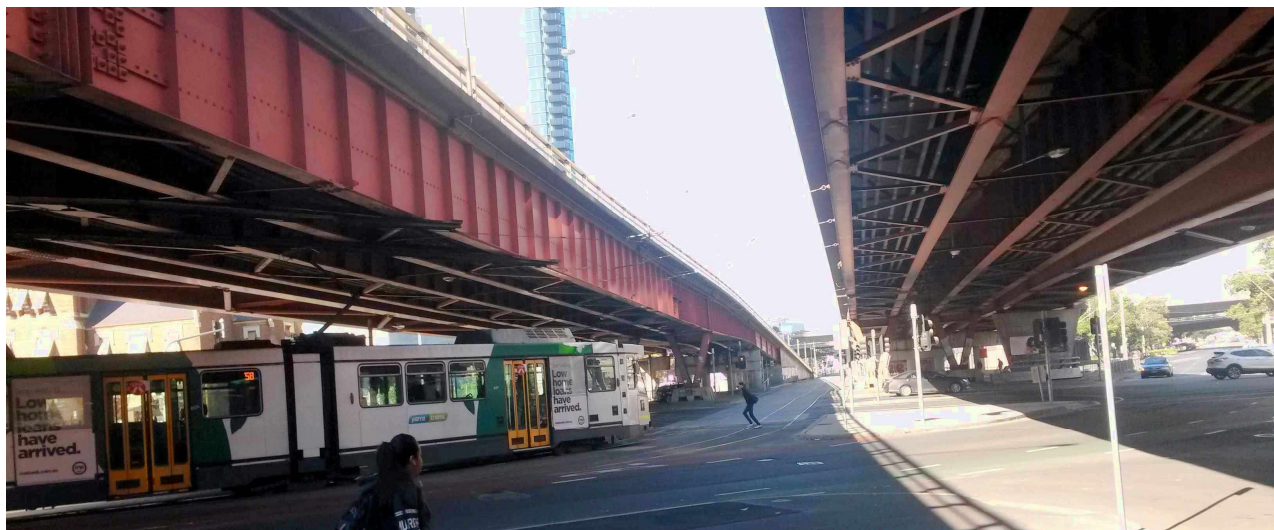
Kings Bridge after repairs. The post-tensioning cables can be seen between the longitudinal beams. The ground level street is City Rd. *The Author
